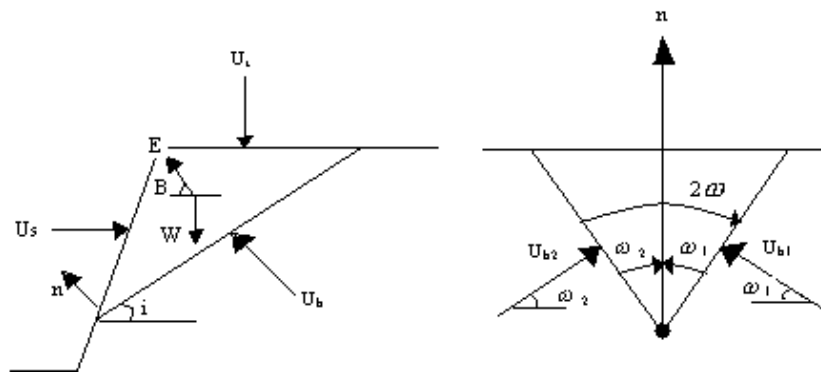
Front and Side Cross-Sectional Views of a Wedge Without a Tension Crack
